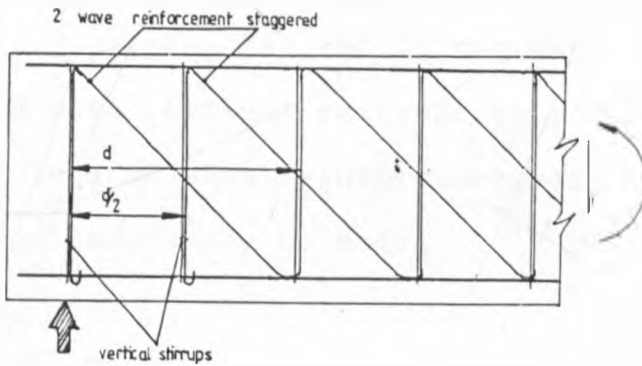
WAVE REINFORCEMENT STAGGERED
